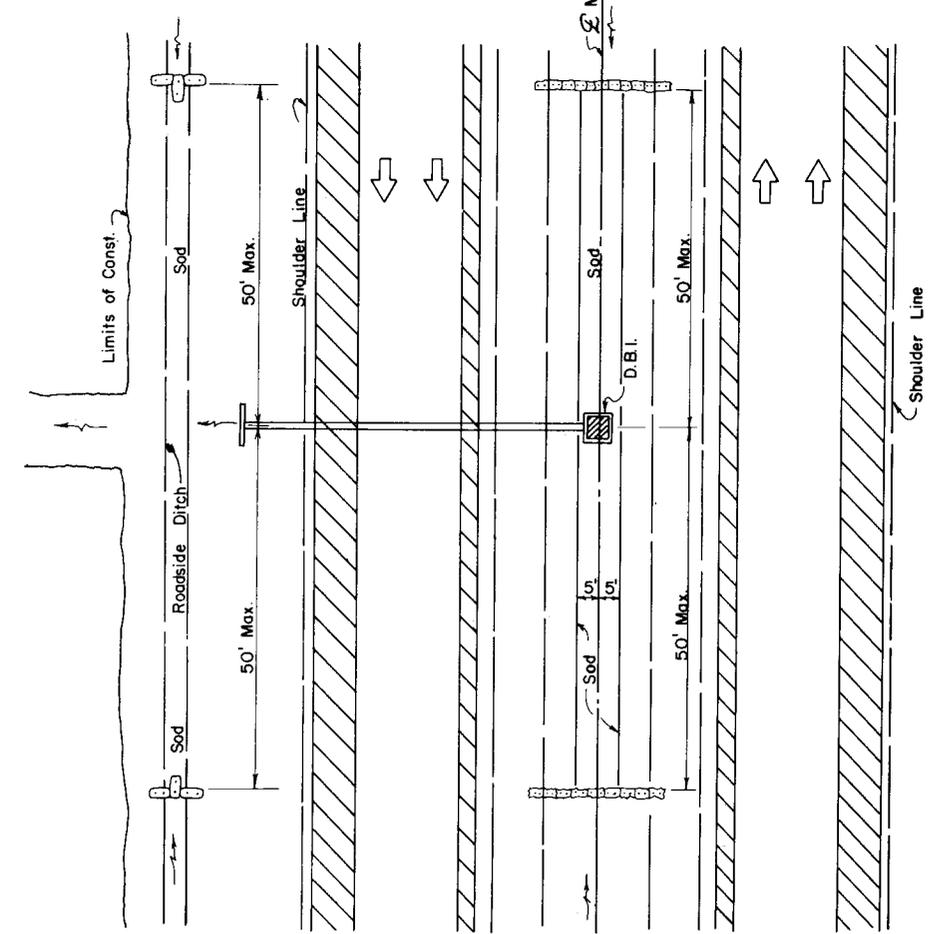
DETAIL OF HAY OR STRAW BALE DAM ON PAVED DITCH
